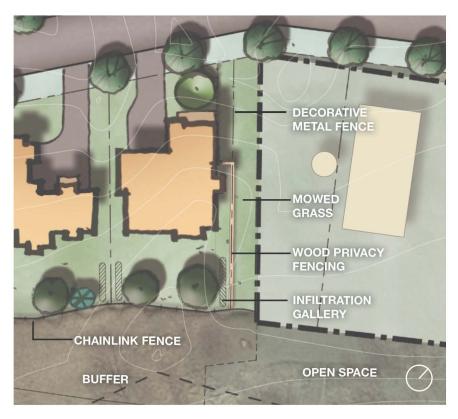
Conceptual Landscape Plan of the 5m Stormwater Drainage Block
